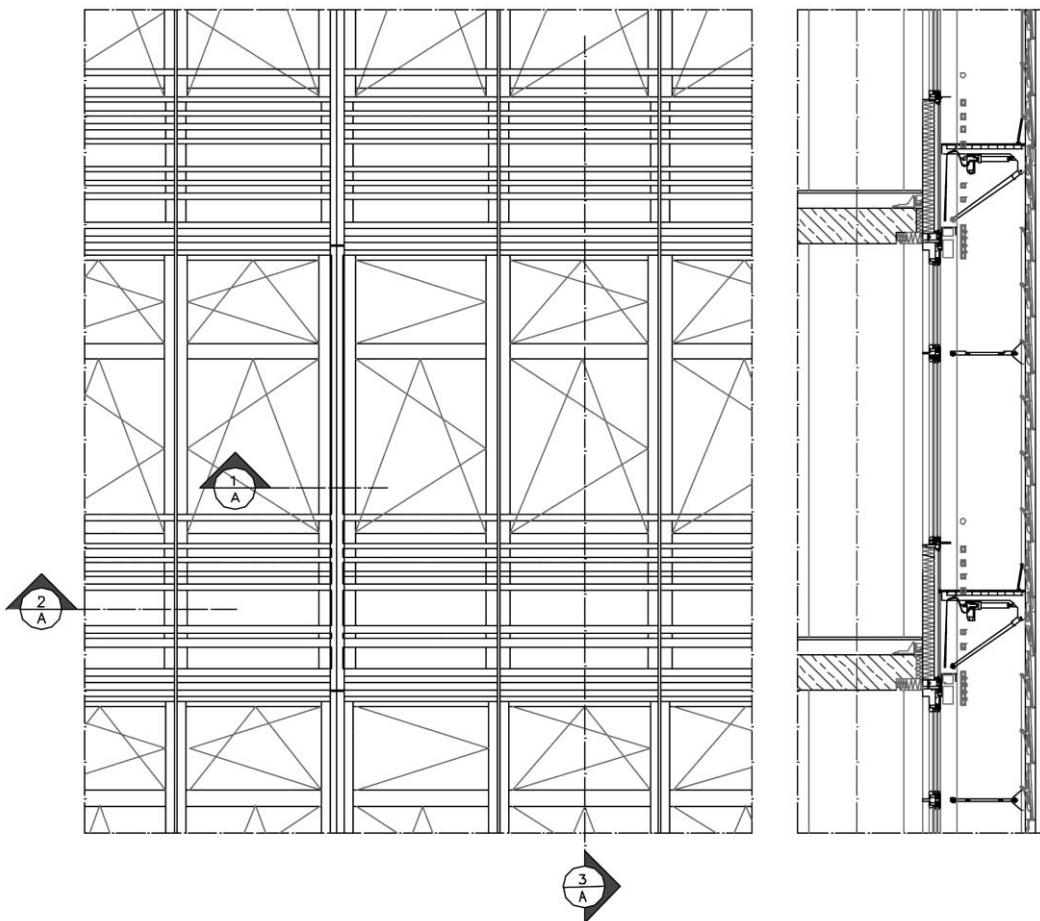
Sustainable methods of the multistory systems (Renzo Piano Building Workshop, Debis-C1 Building, Potsdamer Platz sector, Berlin): functioning of the outer blades, pivoted to the mullions (connected by the brackets to the profiles outside the façade plane), according to the adjustment guided by the electrically-operated vertical control rod.
